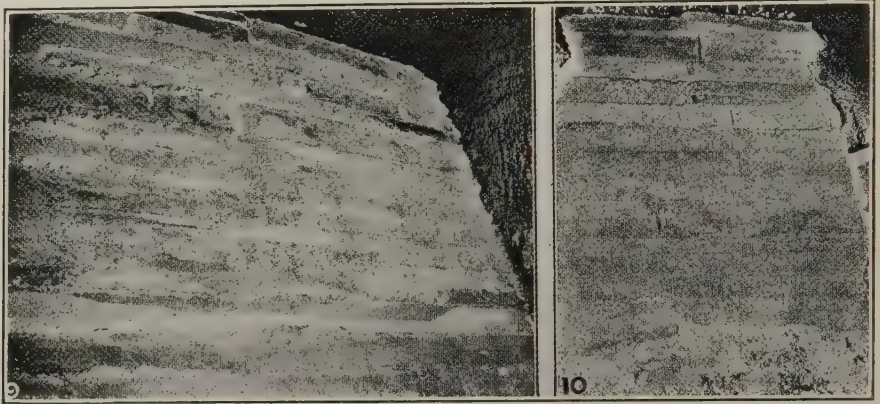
Method of building bridge wall of Fig. 8 by the monolithic method.
